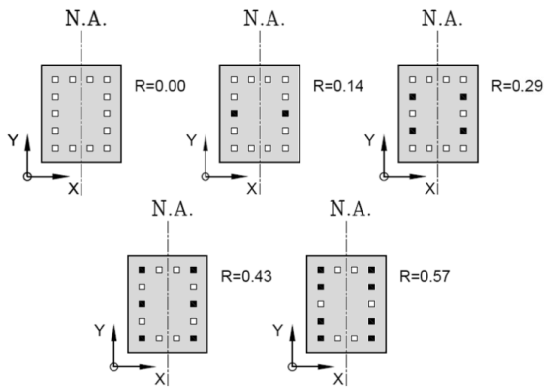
Arrangements of longitudinal reinforcement in section of beam.
